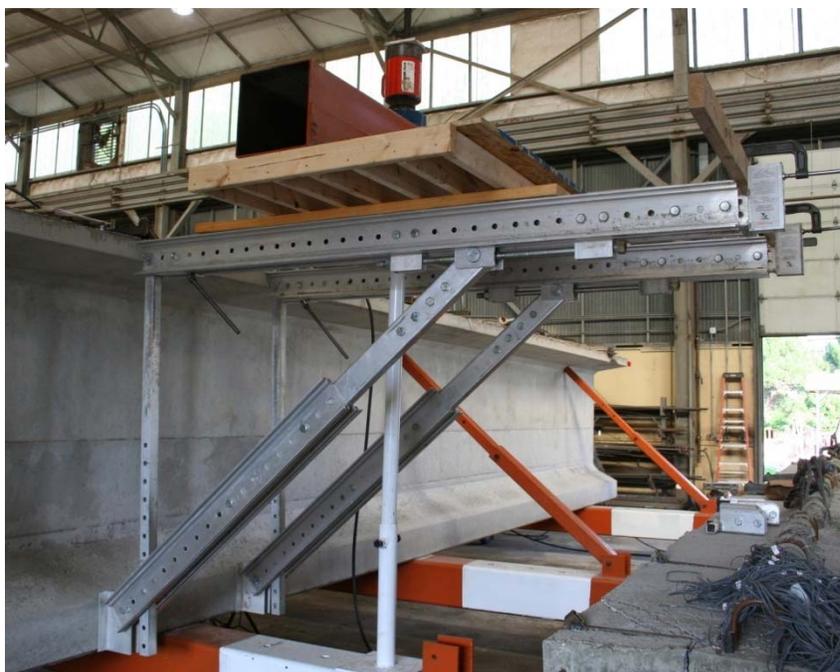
HF-96 Aluminum overhang brackets installed on Tx-70
